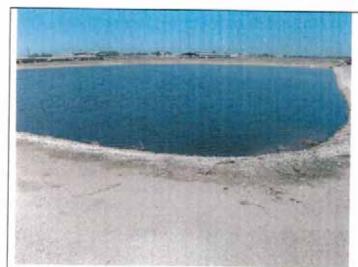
Typical condition of all storage lagoons at the facility. No signs of berm erosion and/or animal burrowing. Note 3'-5' freeboard.
